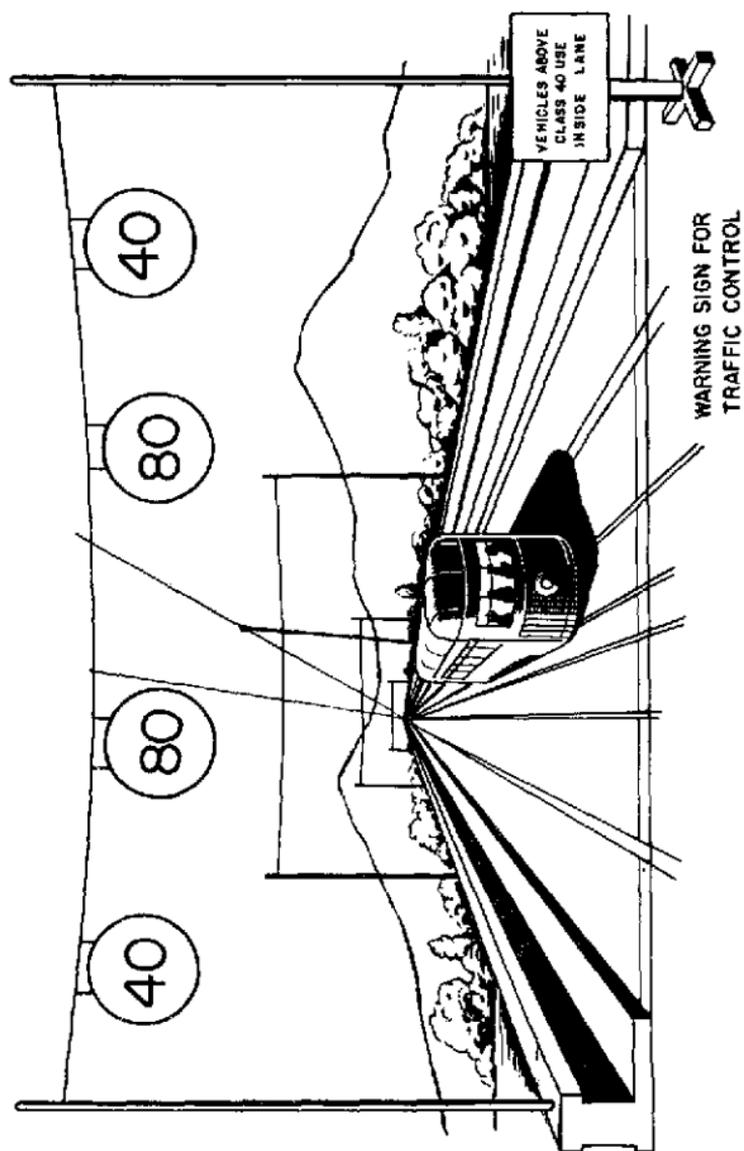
Typical multilane bridge applications of bridge class signs and road regulatory signs.
